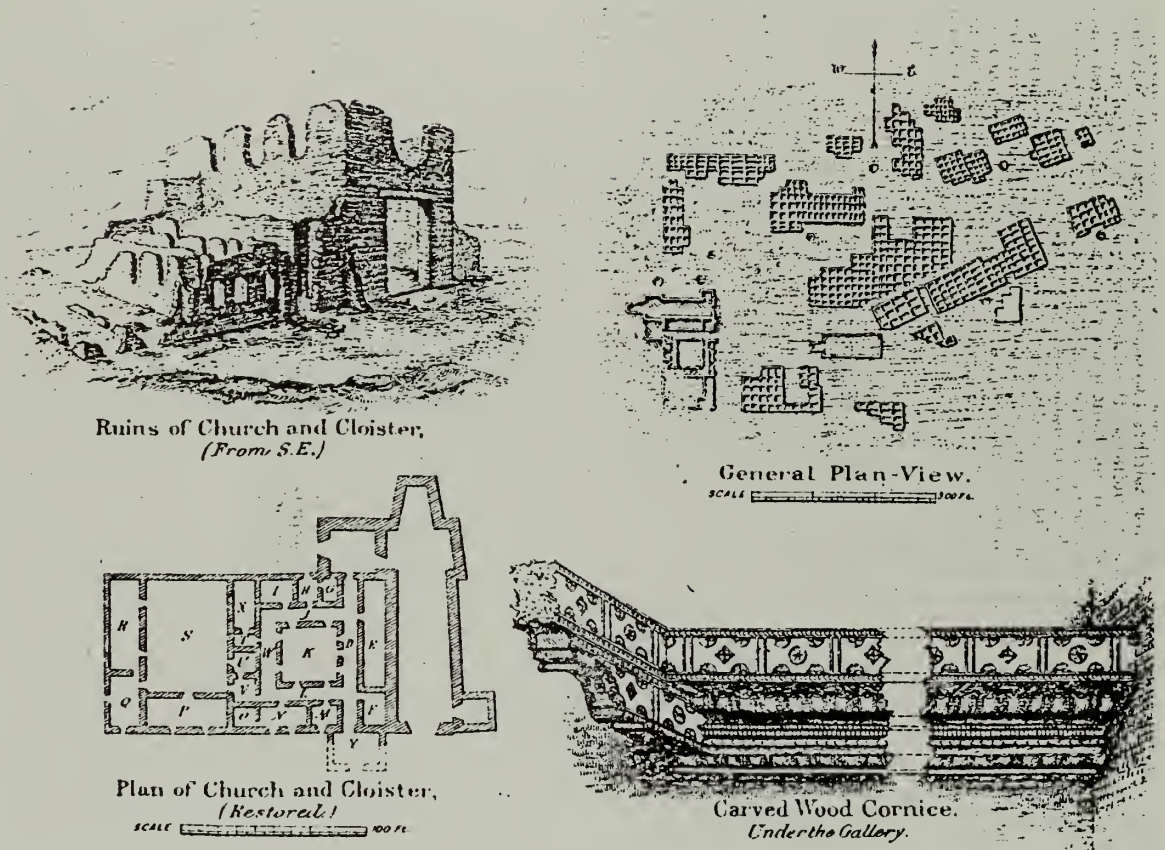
San Buenaventura in 1877, as sketched by Morrison. Morrison's plan of the church and convento are quite accurate, much more so than Bandelier's plan made six years later. Morrison's plan of the pueblo and churches is distorted, but not much worse than Bandelier's map. Morrison's major contribution, however, is the perspective drawing of the church ruins and the detailed sketch of the choir loft woodwork. Although a comparison with surviving fragments of the choir beams in later photographs shows that Morrison did not depict the shape of the corbel with complete accuracy, he still was able to capture the intricacy of the entablature carving and the complex interconnections of the various pieces of woodwork.
